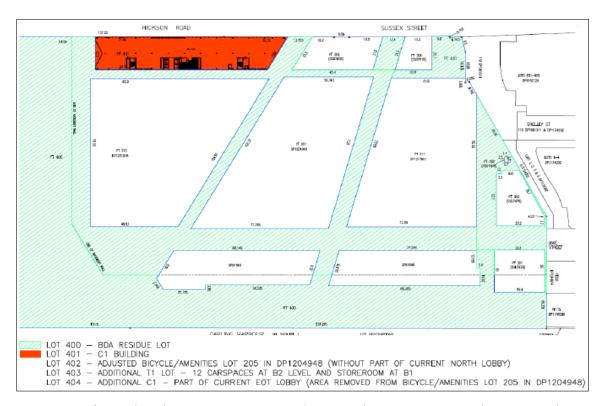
| Level 1 (south) showing proposed Lot 401 (red shading) and proposed Lot 400 (green hatching) (Source: Applicant)
